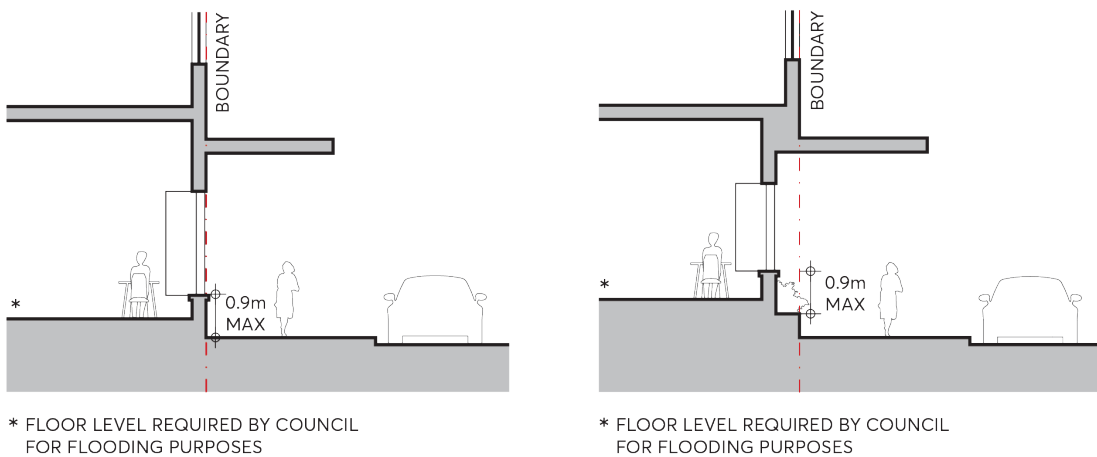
A – The Street Wall: Active frontage set back
